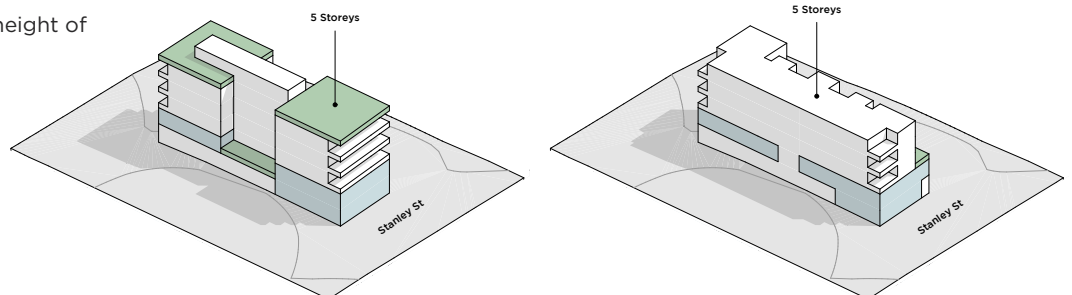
Built form testing to show the proposed floor area ratio and built form controls on a mid-block site in Spencer (DDO29-1). Images are indicative only to test the proposed controls and are not representative of actual building proposals (*West Melbourne Built Form Testing*, Breathe Architecture).
